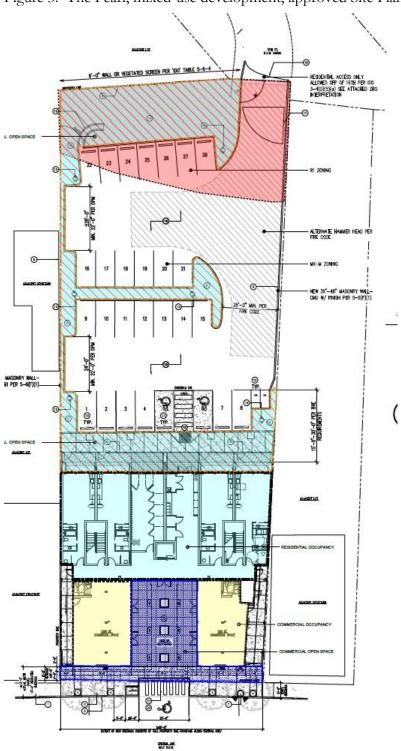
The Pearl, mixed-use development, approved Site Plan.
